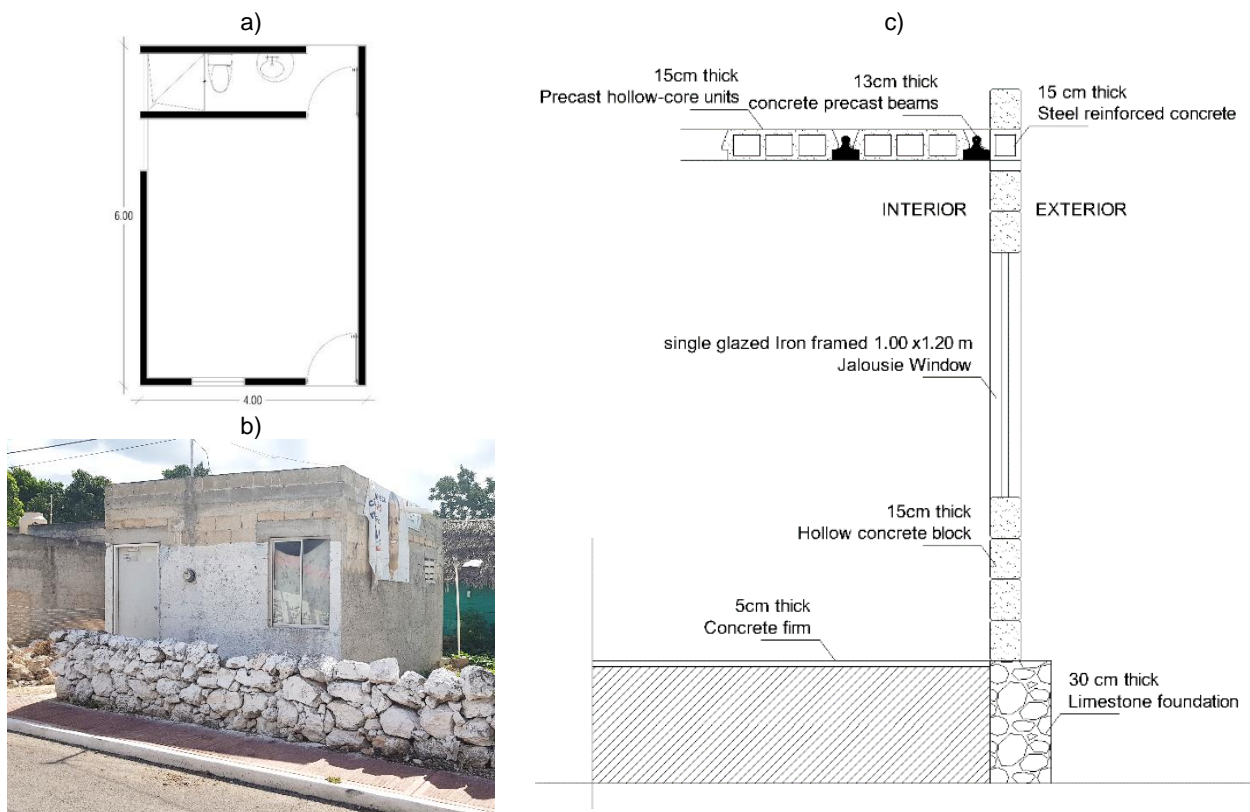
Description of the house a) Floorplan, b) Exterior façade, c) section.
